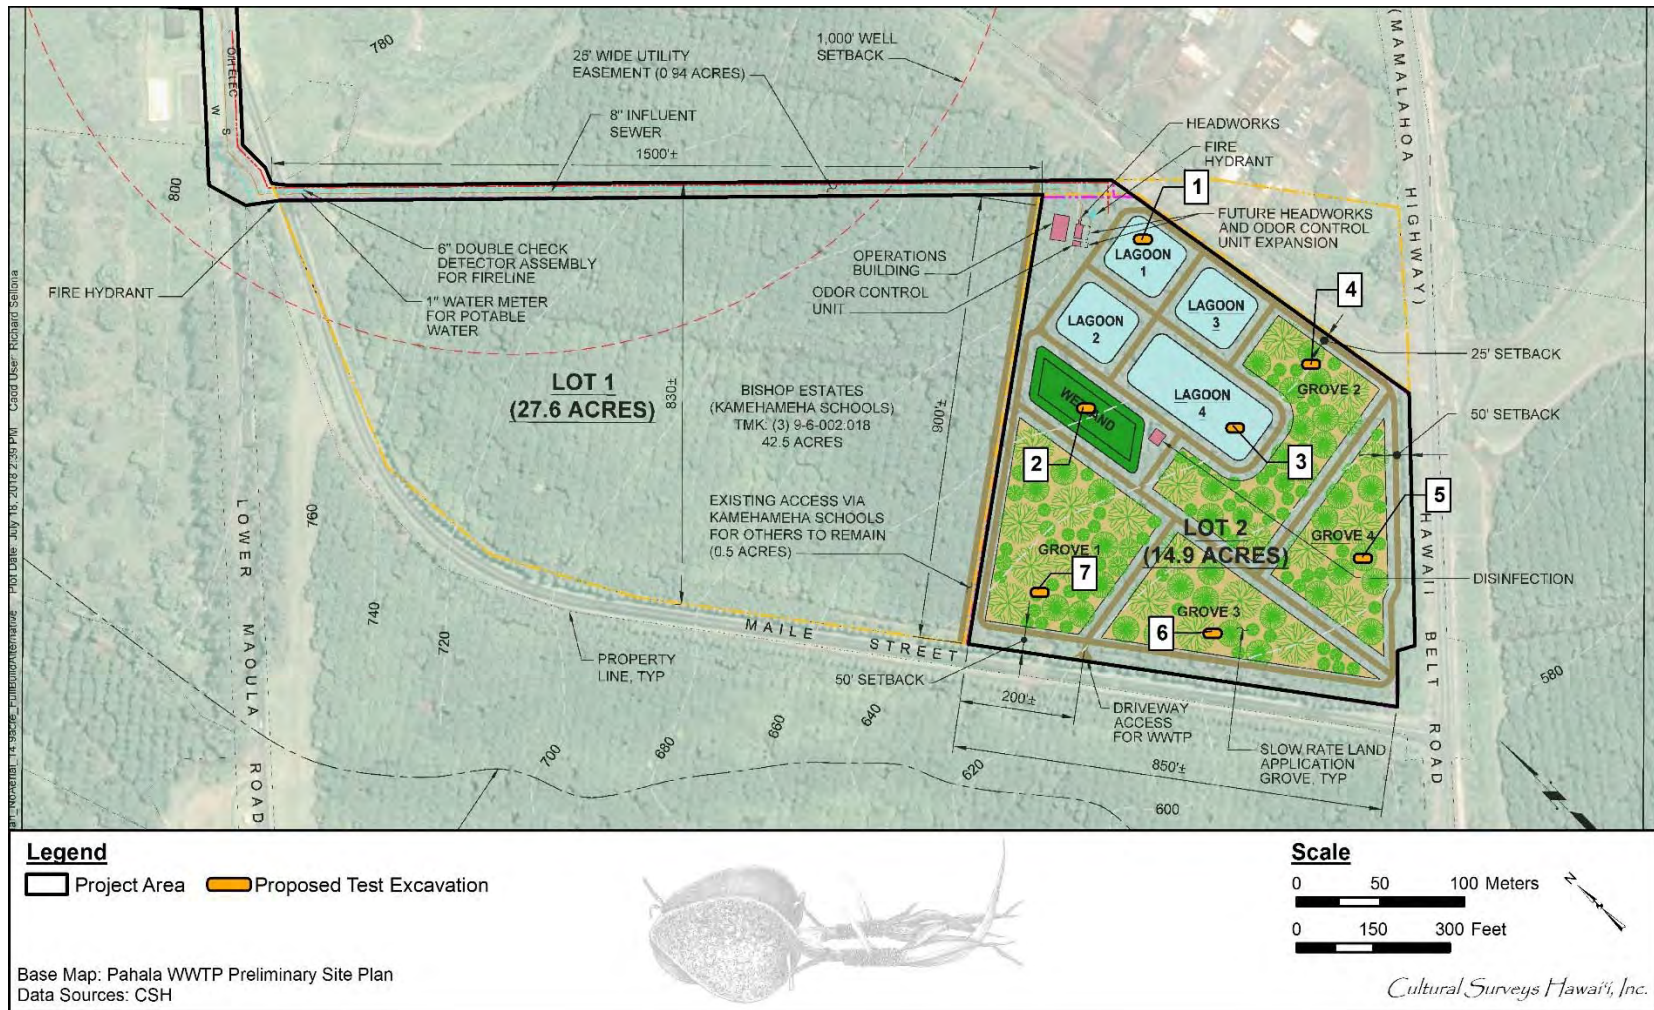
Pahala WWTP Preliminary Site Plan showing AIS test excavation locations
